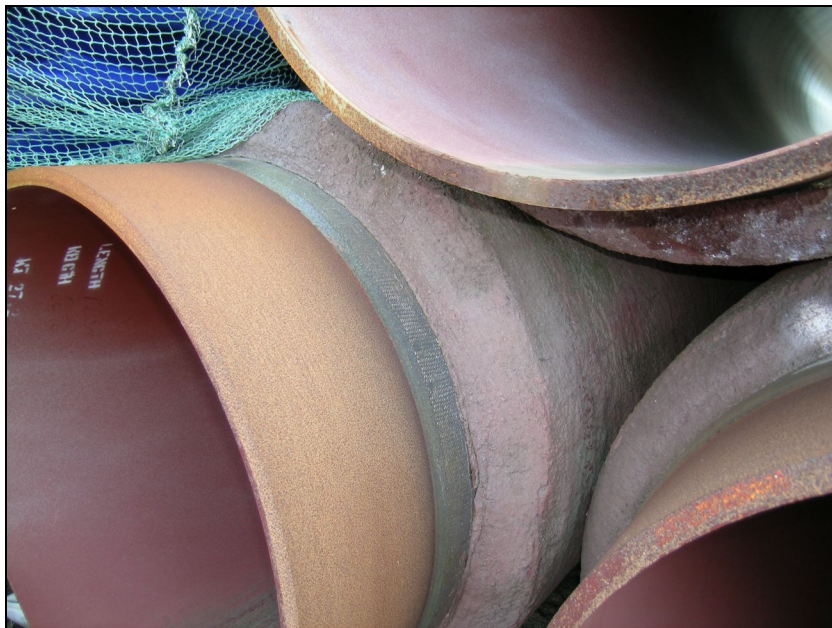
Illustrating the different pipe layers: steel, asphalt and concrete.
